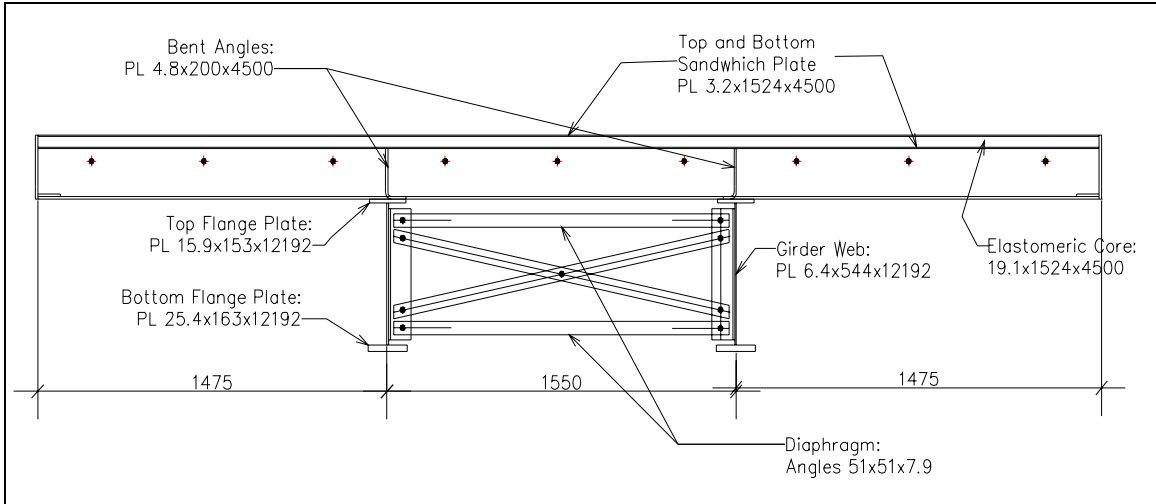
CROSS SECTION OF HALF SCALE SIMPLE SPAN BRIDGE
